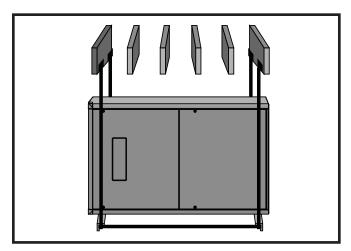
TC Horizontal Installation Suspended in Attic or Crawl Space
